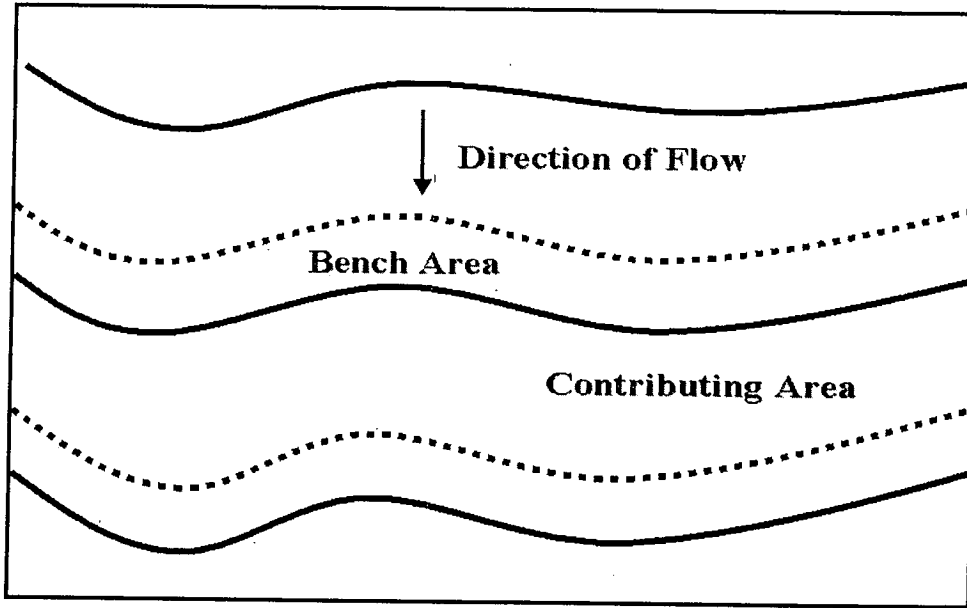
Plan view of a conservation bench terrace system showing two terraces.
